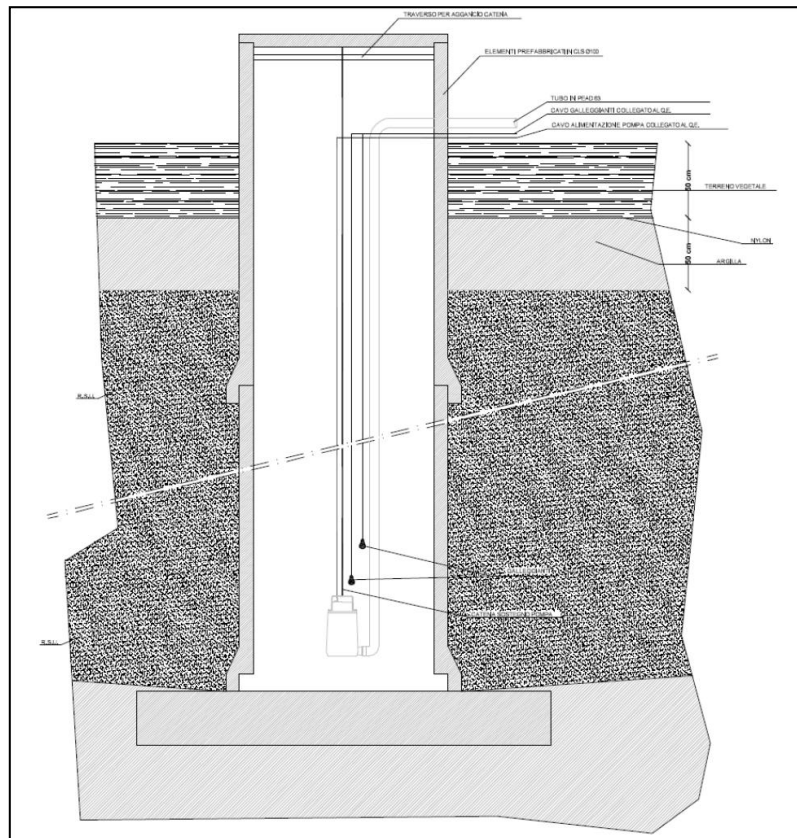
Detail of a leachate well, provided of a submersible pump.
